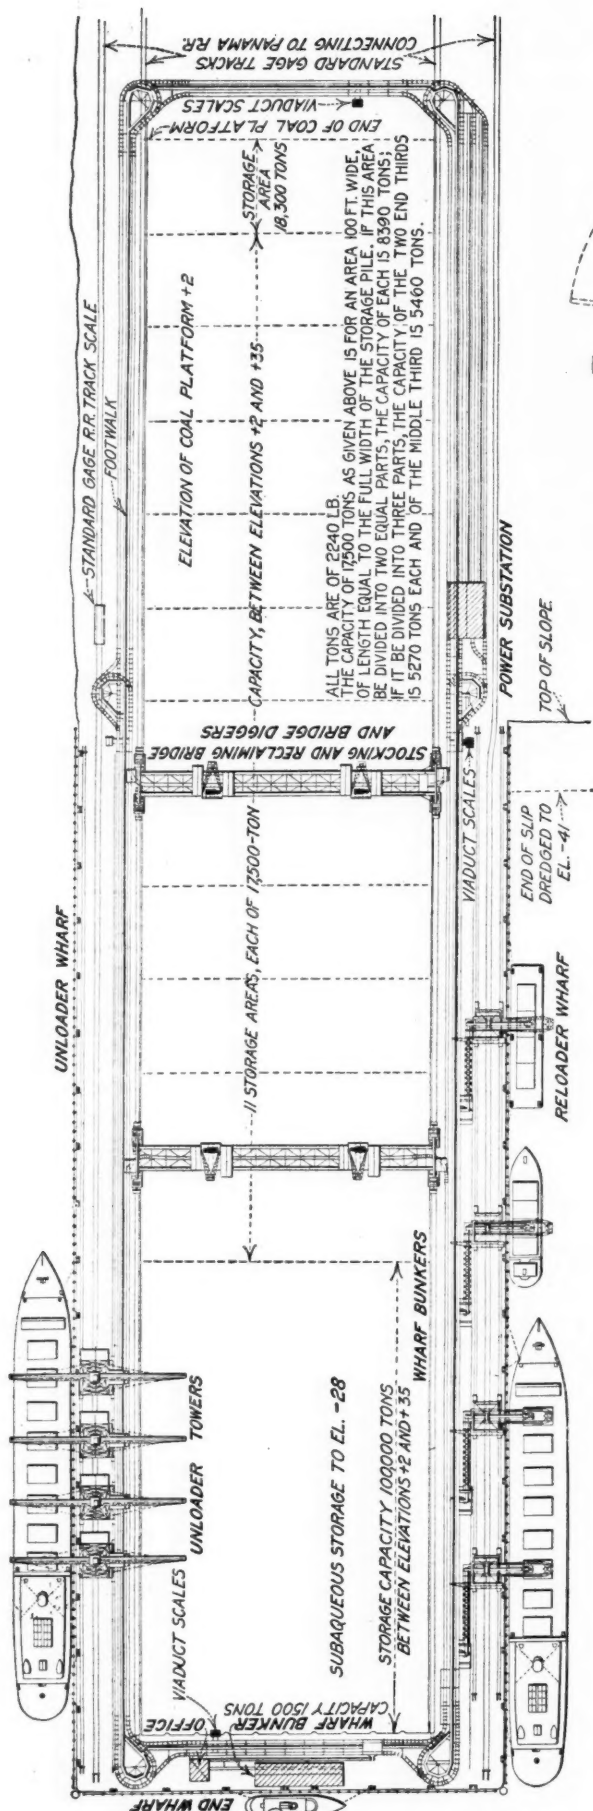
PLAN AND SECTIONAL VIEWS OF THE COAL-STORAGE PLANT AT CRISTOBAL, PANAMA CANAL
